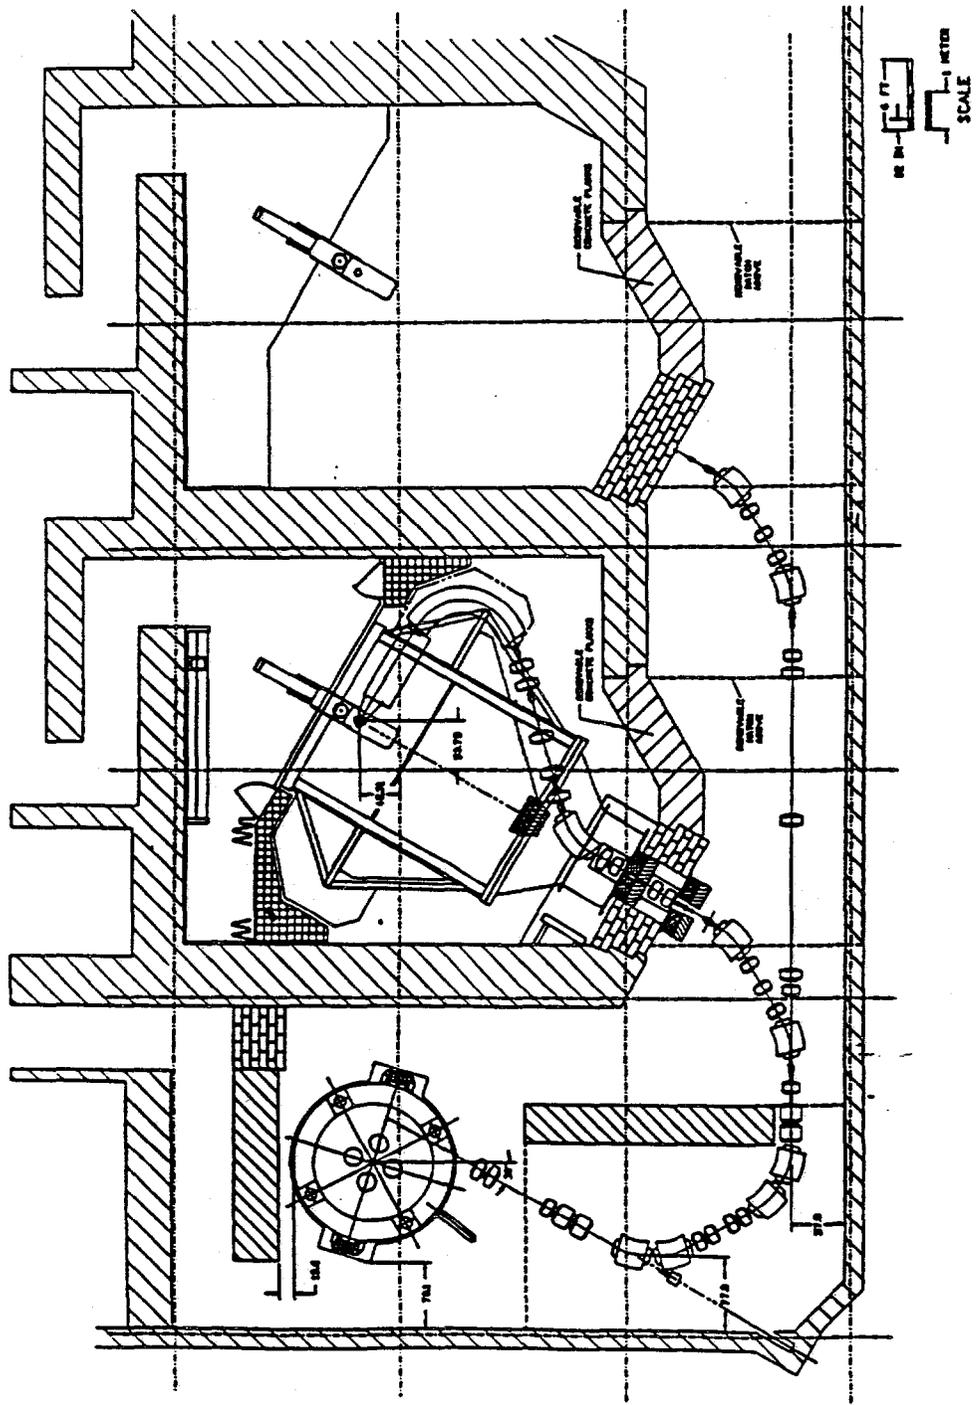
Equipment layout for the Northeast Proton Therapy Center, now under construction.
